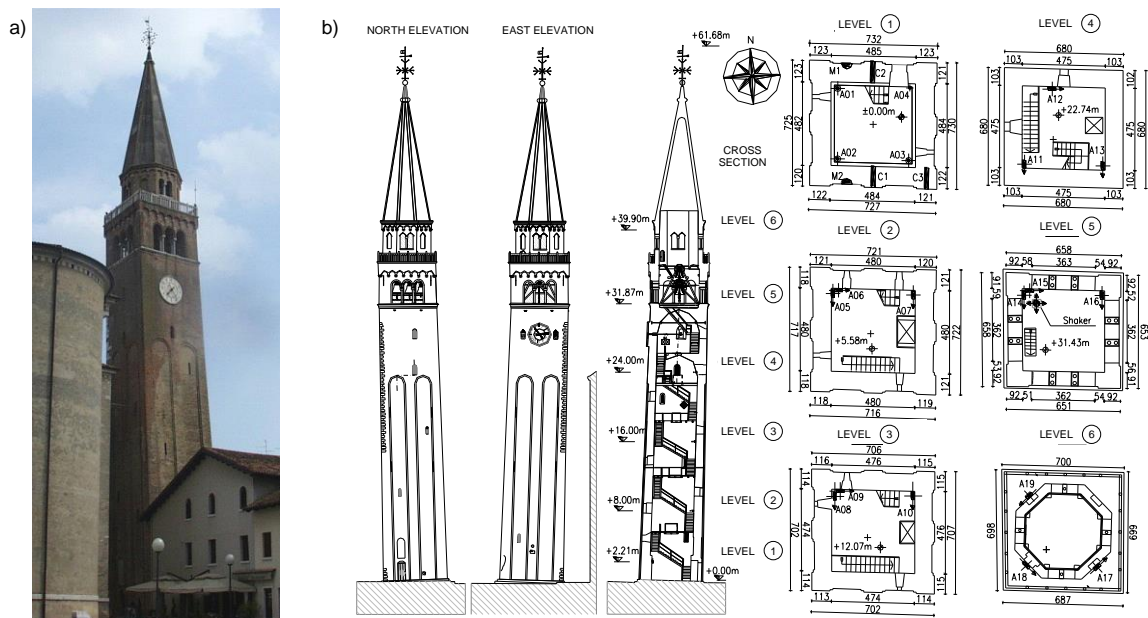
Overview of the Tower (a); North and East elevation, cross-section and plan views at different levels (b)
